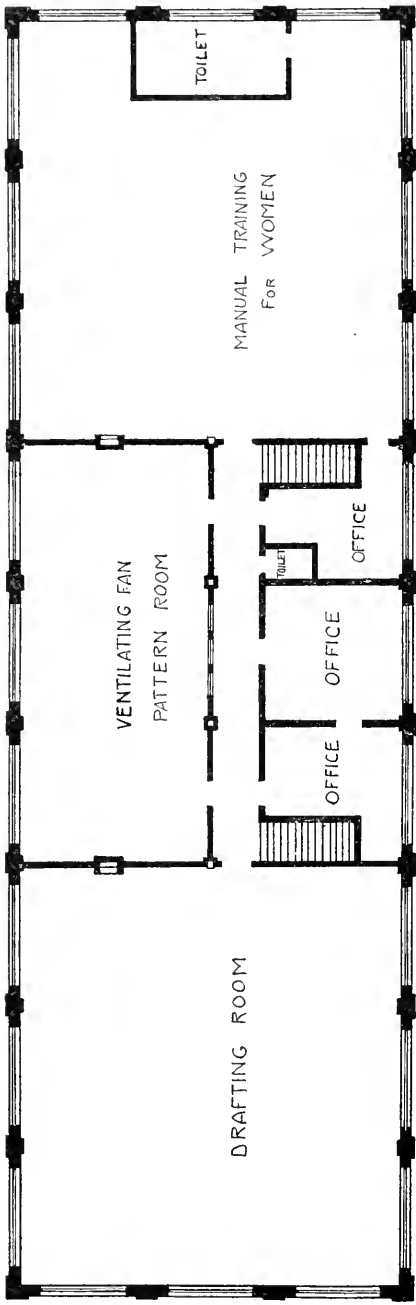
SECOND FLOOR PLAN OF SHOP NUMBER ONE.
